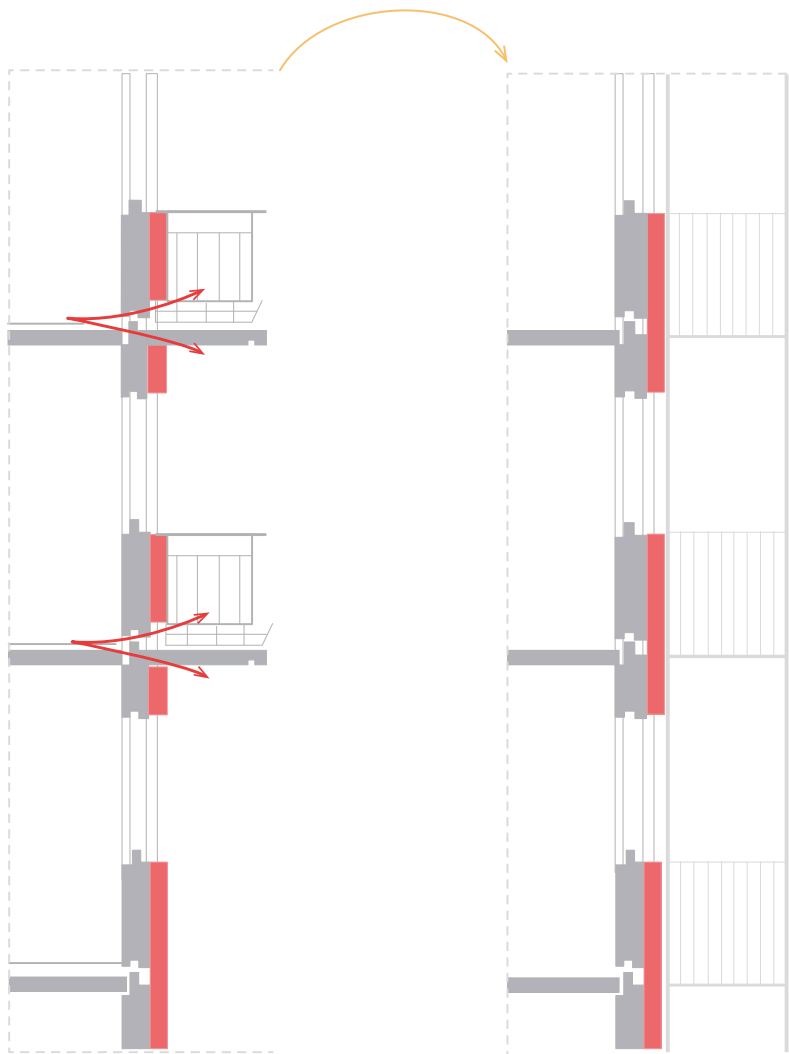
Old cantilevered balconies with thermal bridges; a new balcony tower.
